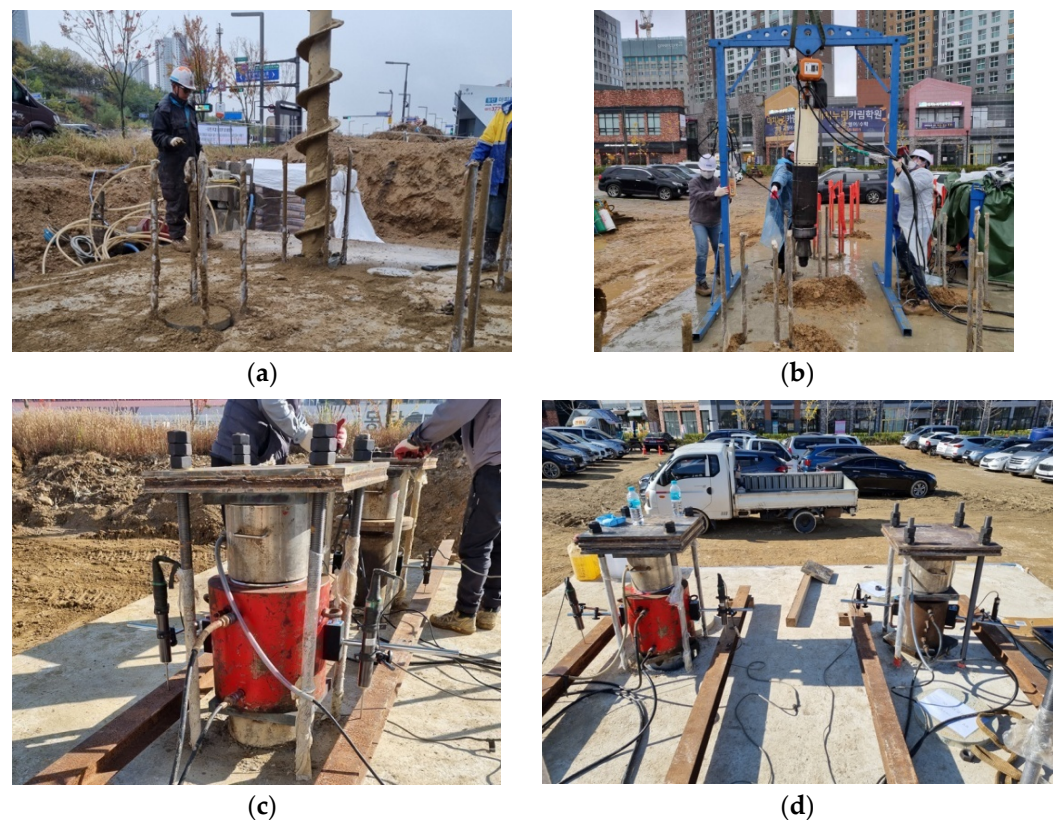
Field load test process for testing field applicability of expanded steel pipe pile: (a) Installation of steel pipe; (b) Expansion of steel pipe pile using full-scale hydraulic expansion equipment; (c) Installation of reaction force devices; (d) Static pile load test.
